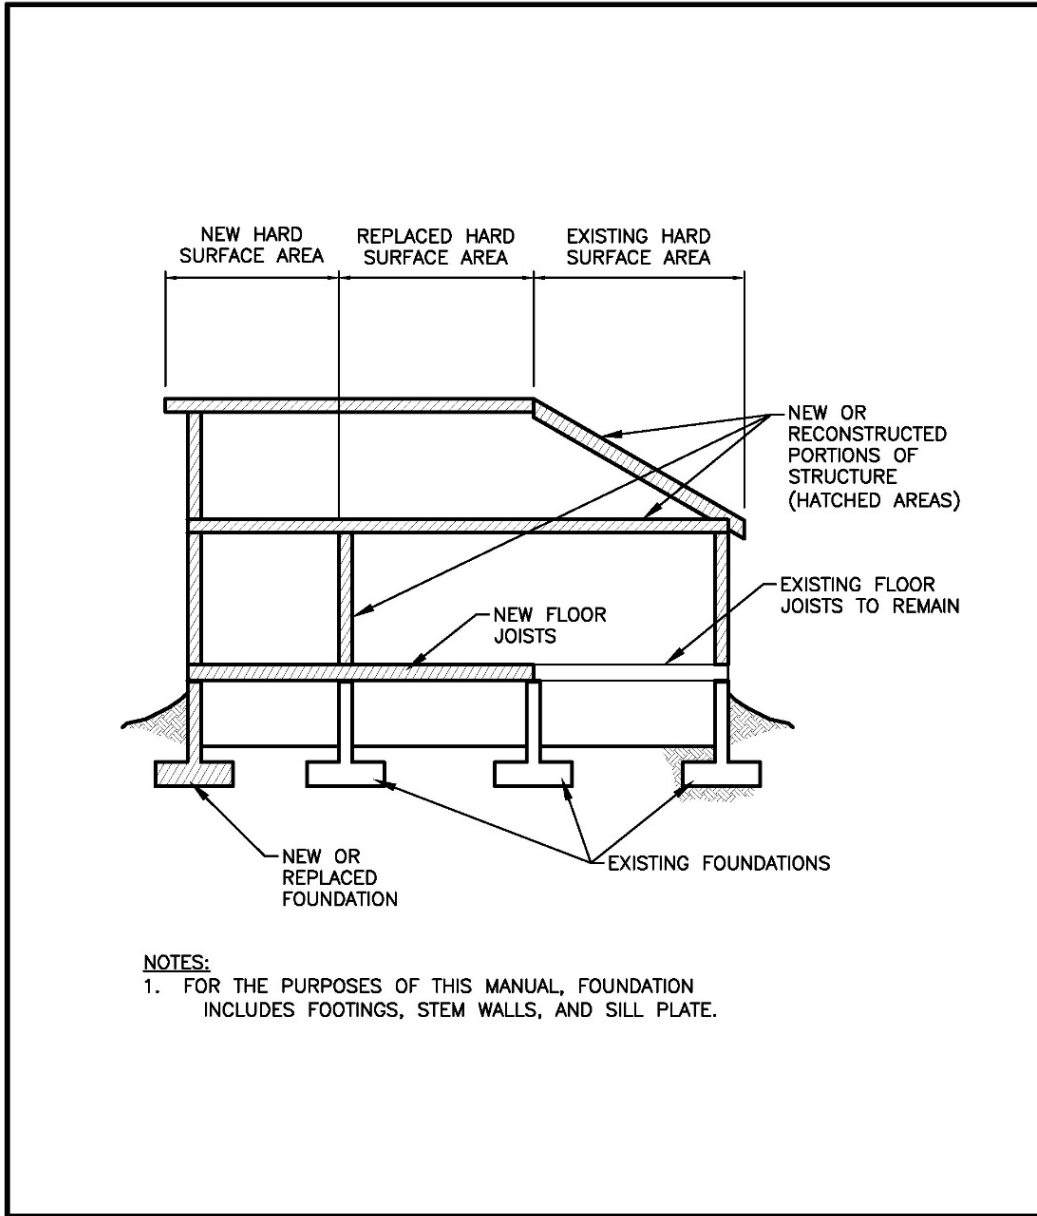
Example with New, Replaced, and Existing Hard Surfaces.
